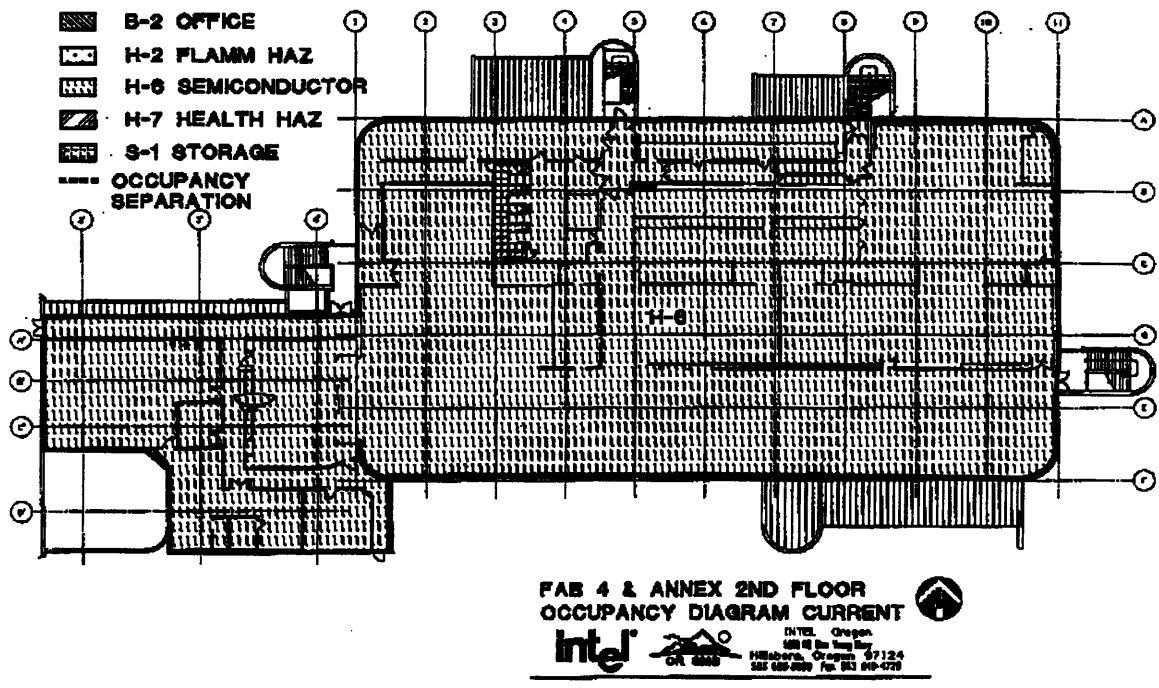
Fab 4 - Second Floor Occupancy Diagram, June 1996
